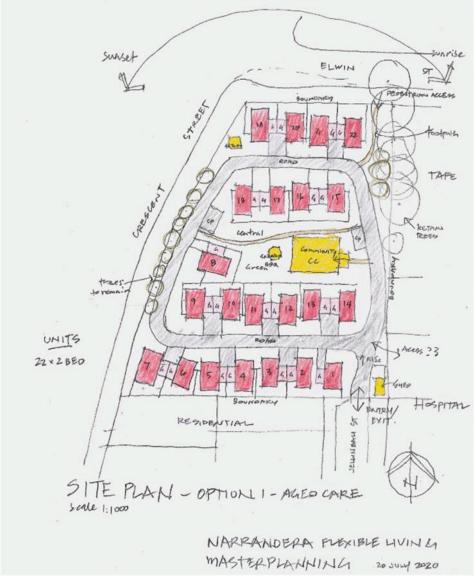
MASTERPLAN DESIGN CONCEPT - OPTION 1
